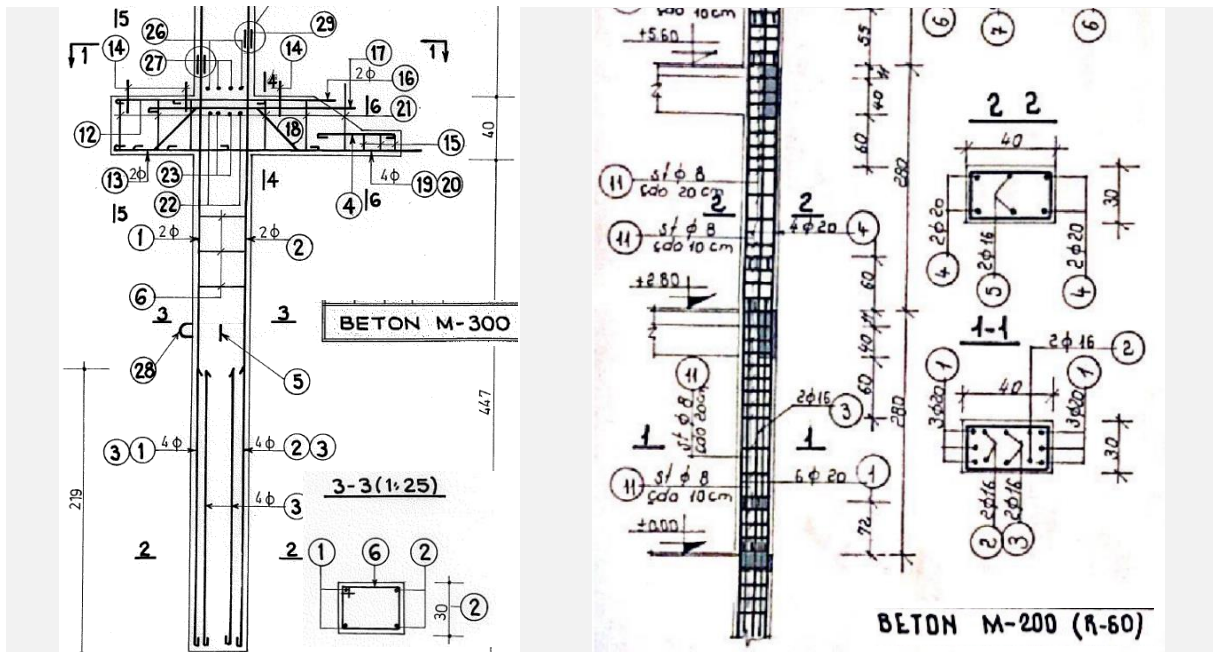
Column material and details: a-) Prefabricated RC Model 82/2: Concrete C25/30; Rebar 4Ø18 (less than 1%); Single hoop Ø6.5/20cm; b-) Cast-in-place RC Model 82/2: Concrete C16/20; Rebar 6Ø20+4 Ø16 (2.2%); Single hoop Ø8/10/20cm
